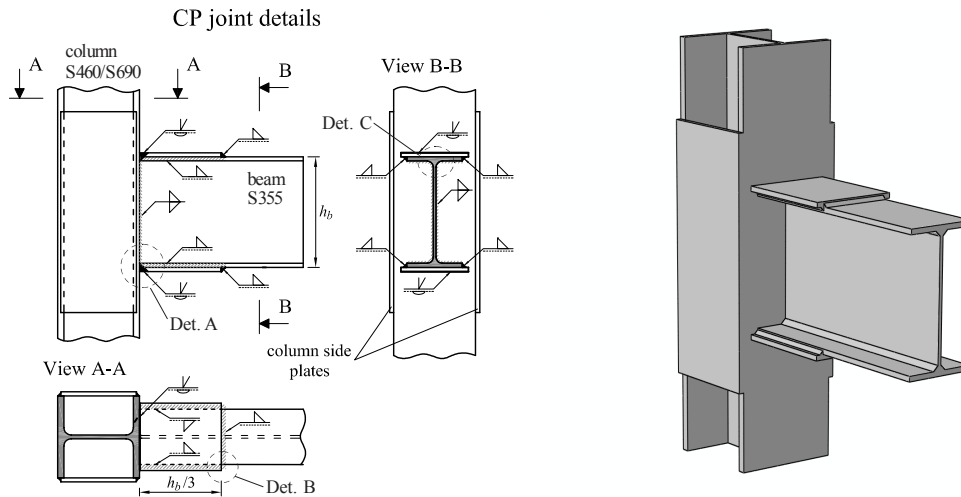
Welded CP beam-to-column joint details (concrete column encasement not illustrated)
